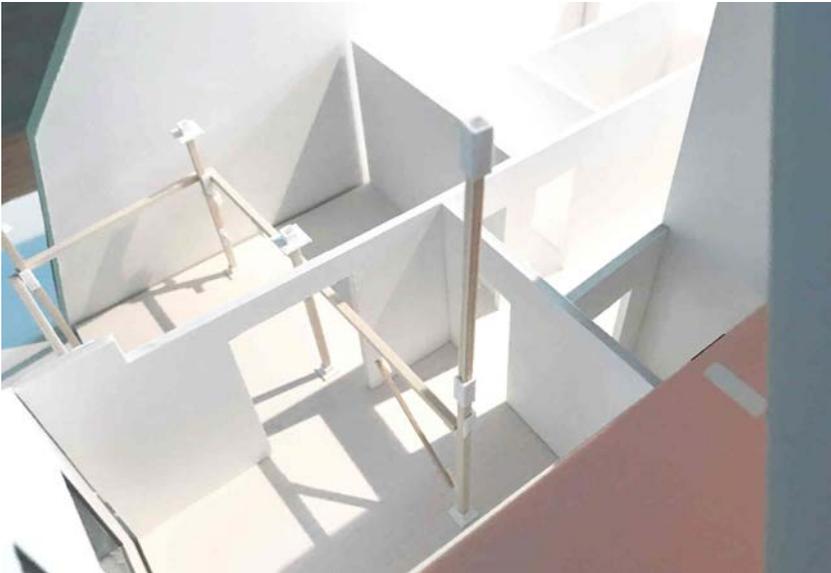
Linear system in contextual model, connecting with existing floor plan and developing within 2 apartments.
